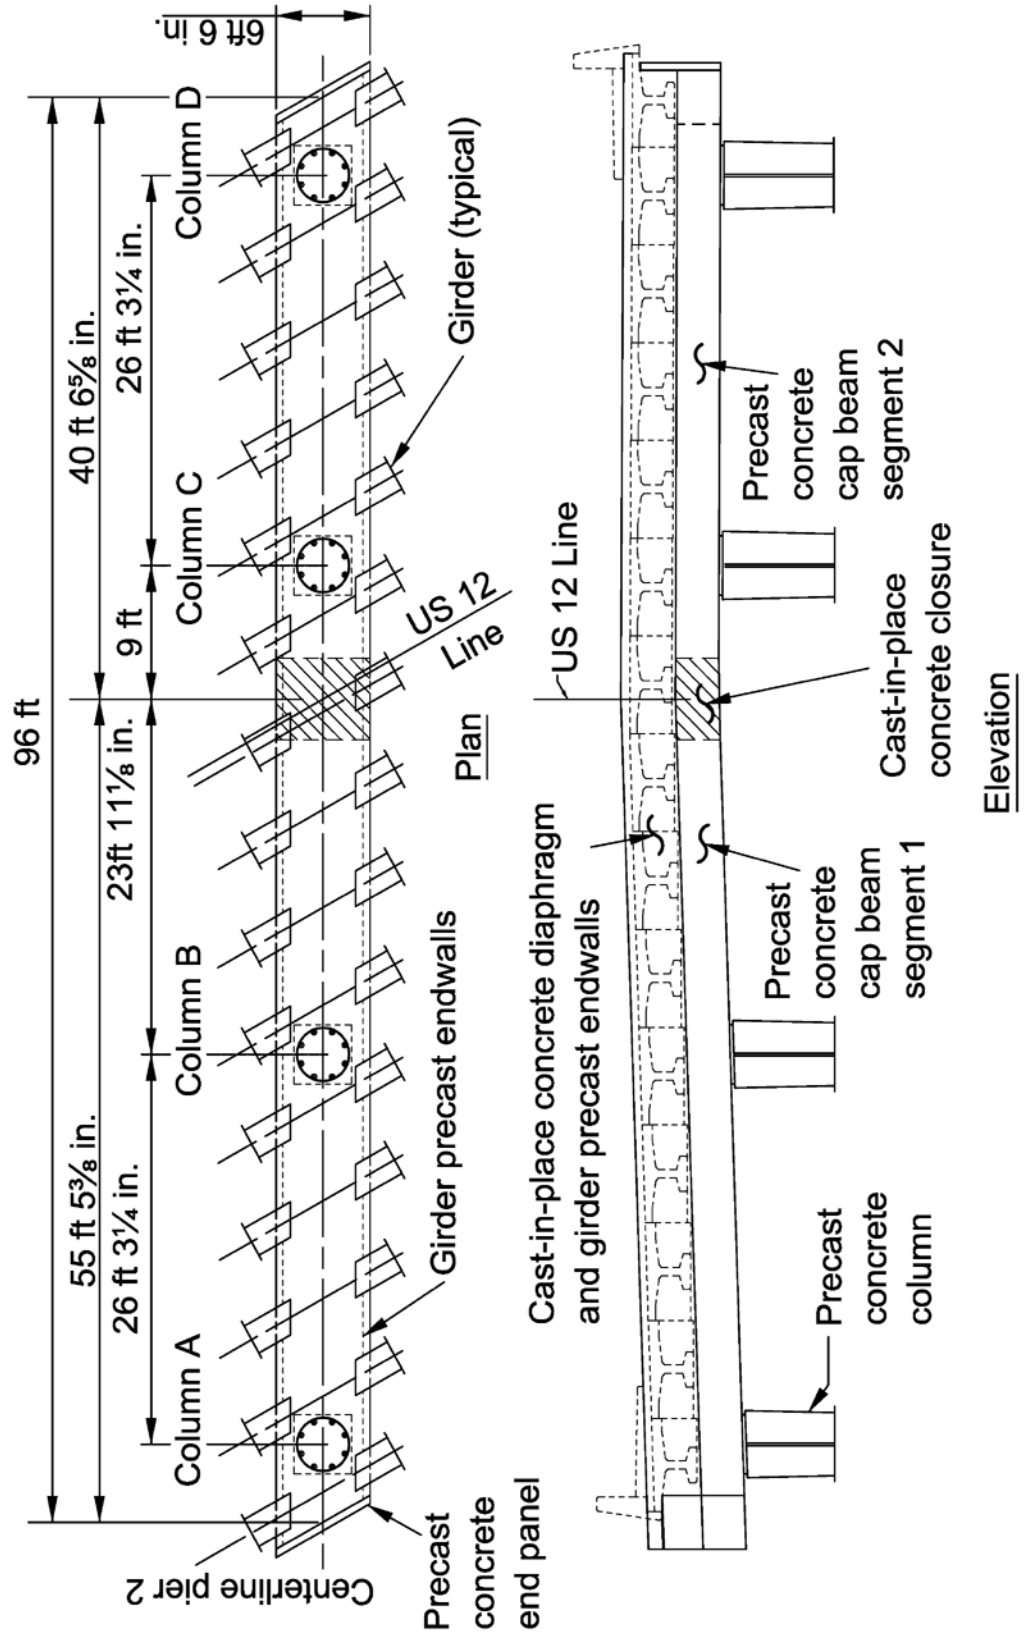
Diagram. Intermediate pier cap beam plan and elevation.
